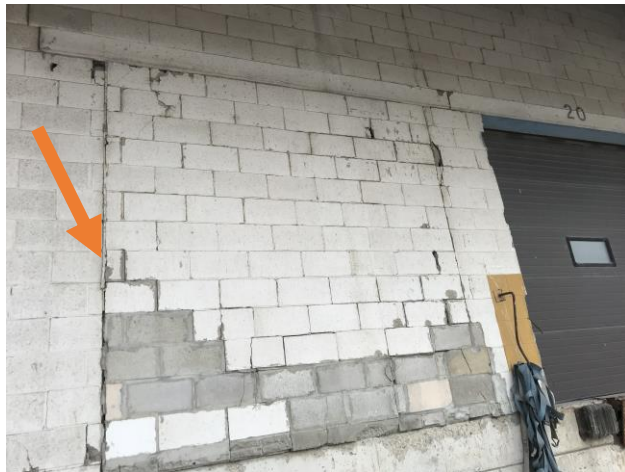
to 17: View of the asbestos-containing white caulking along the wall and door/windows.
